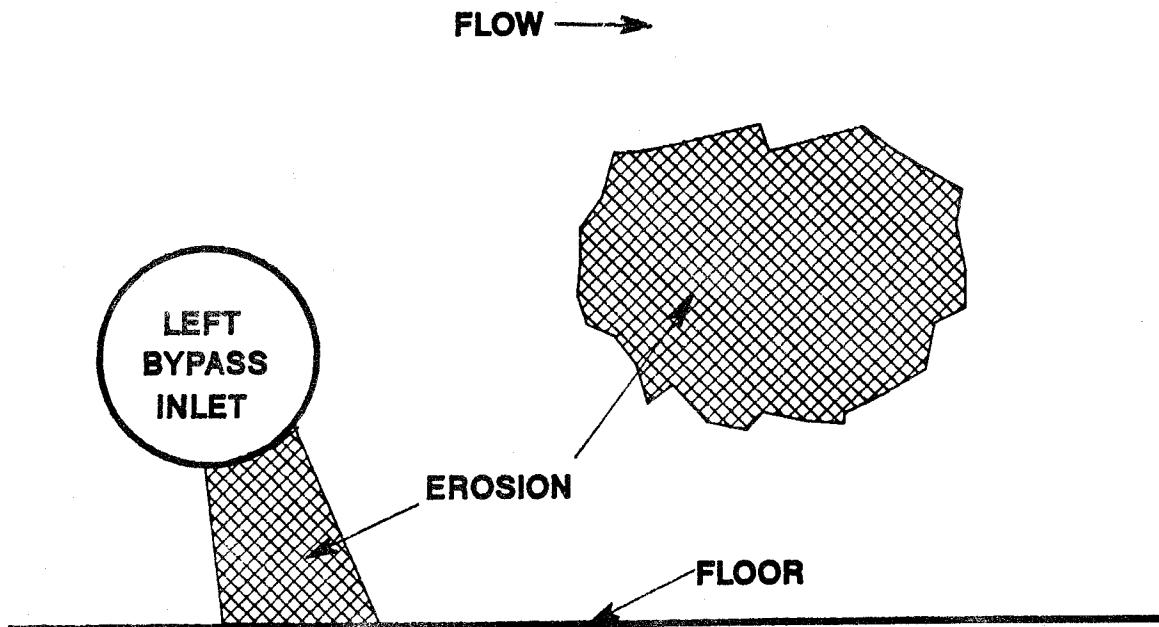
Sketch of cavitation damage in wall of left gate passage, Cave Run Dam, 1982
